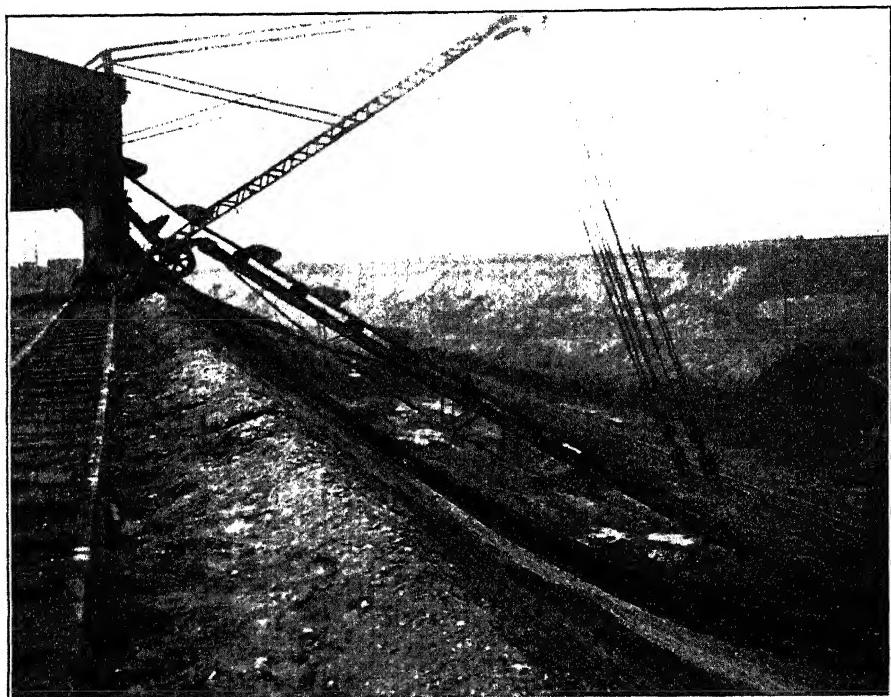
CONTINUOUS-BUCKET EXCAVATOR FOR REMOVING OVERTBURDEN.
